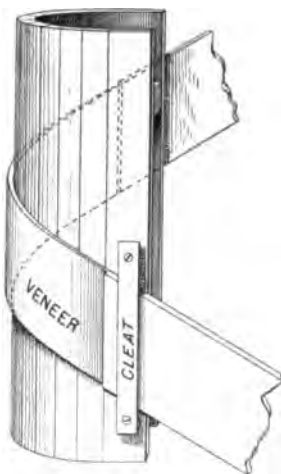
View Showing How Cylindrical Piece of Stringer Is Bent on Drum.
